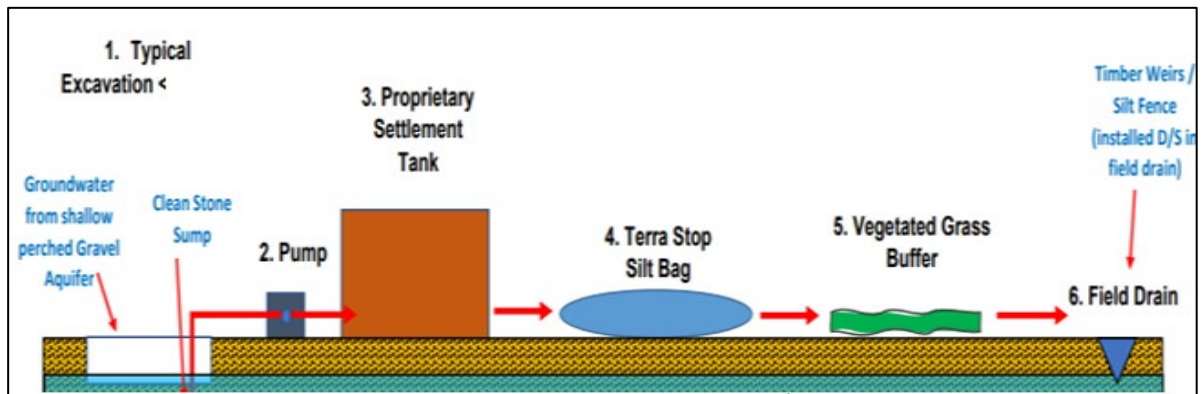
Dewatering Arrangement- Settlement Pond Construction
